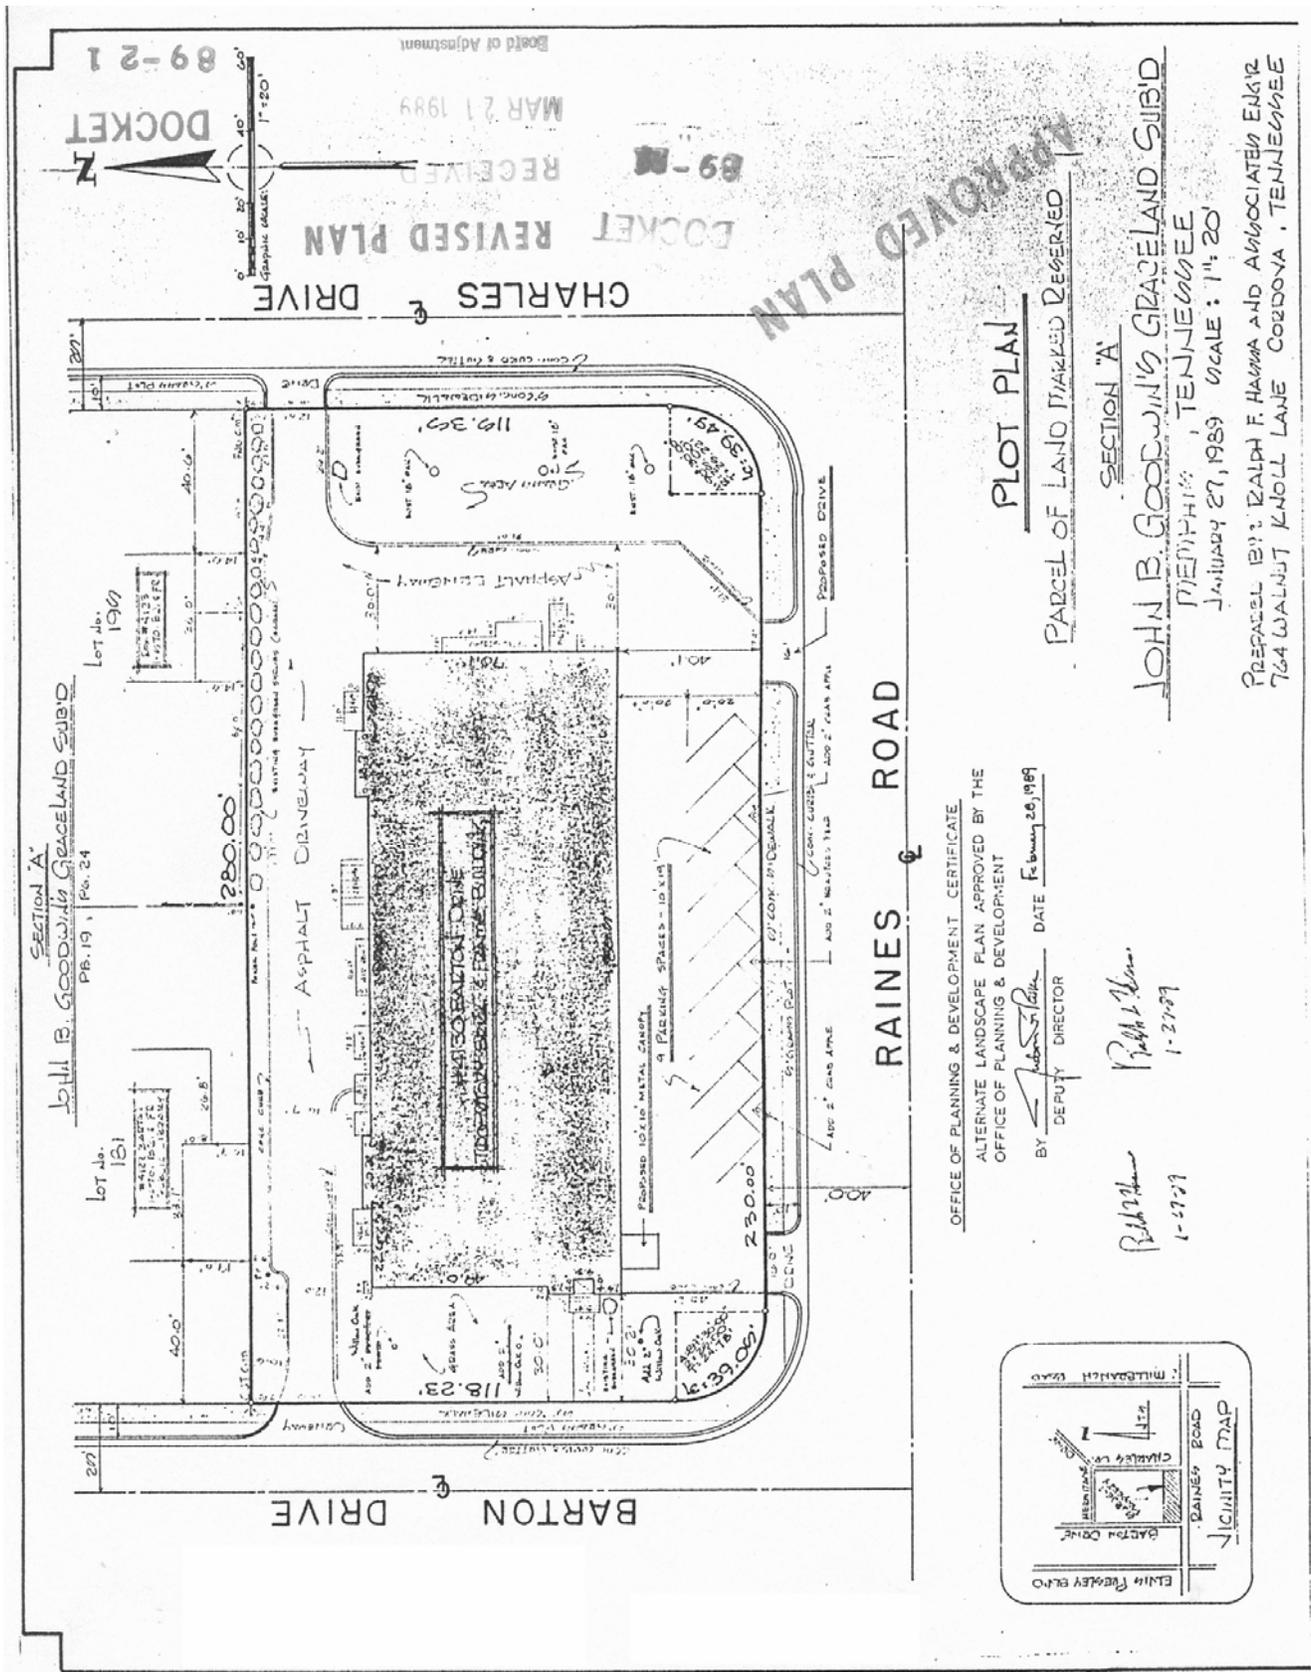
Approved Landscape / Site Plan for B.O.A. Docket # 89-21 City
